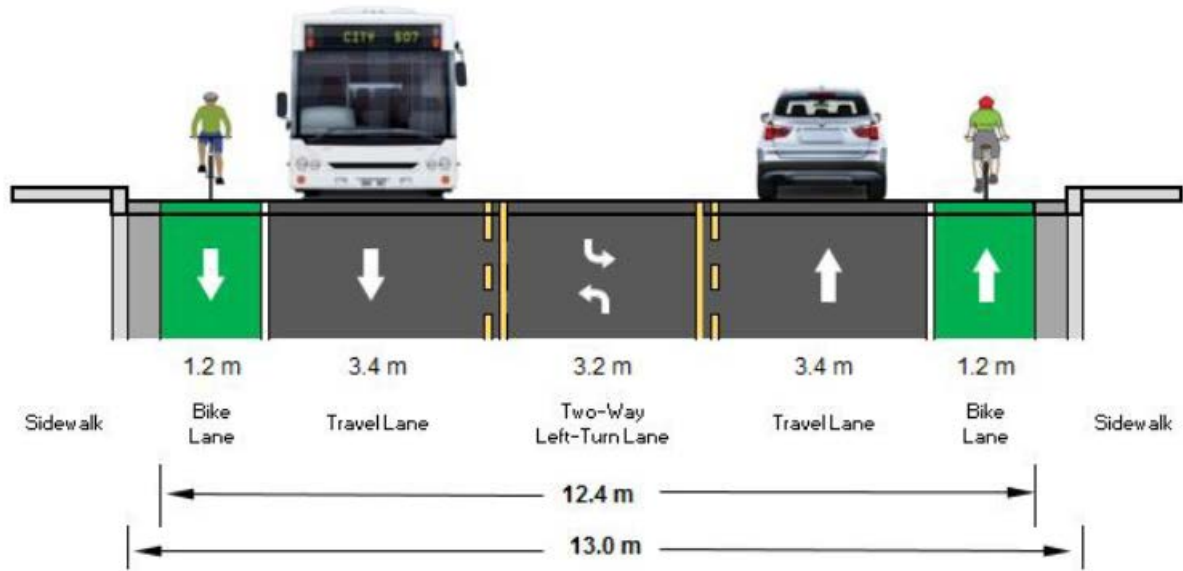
Proposed Road Diet Configuration between North Street and Sackville Road
